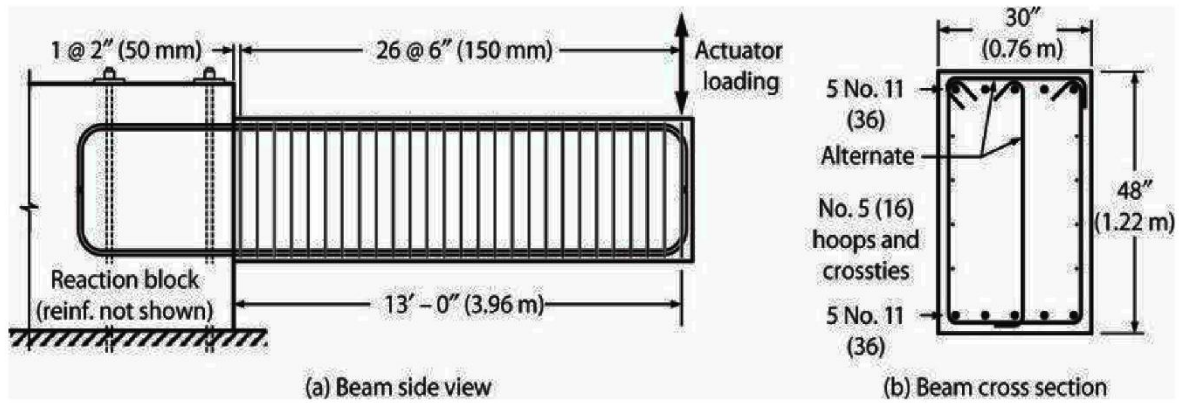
(a) Laboratory test beam. (b) Beam cross section. (After Panagiotou et al., 2013.)
